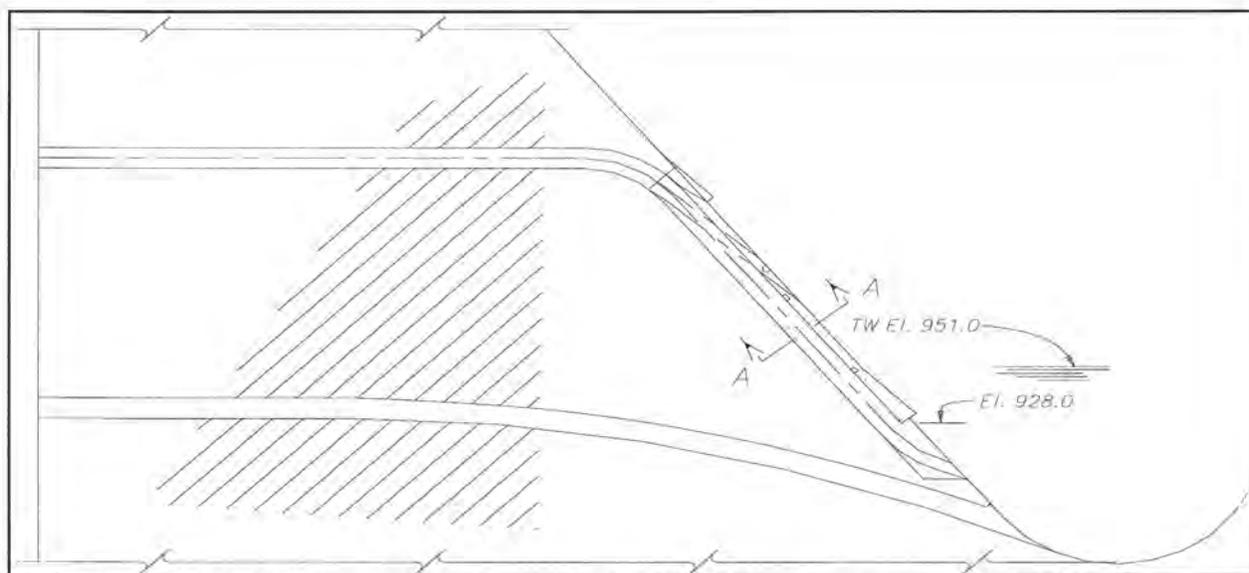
Section view of the modification for extending the mid-level outlet works for alternative No. 2. (fn:extend.wp)
